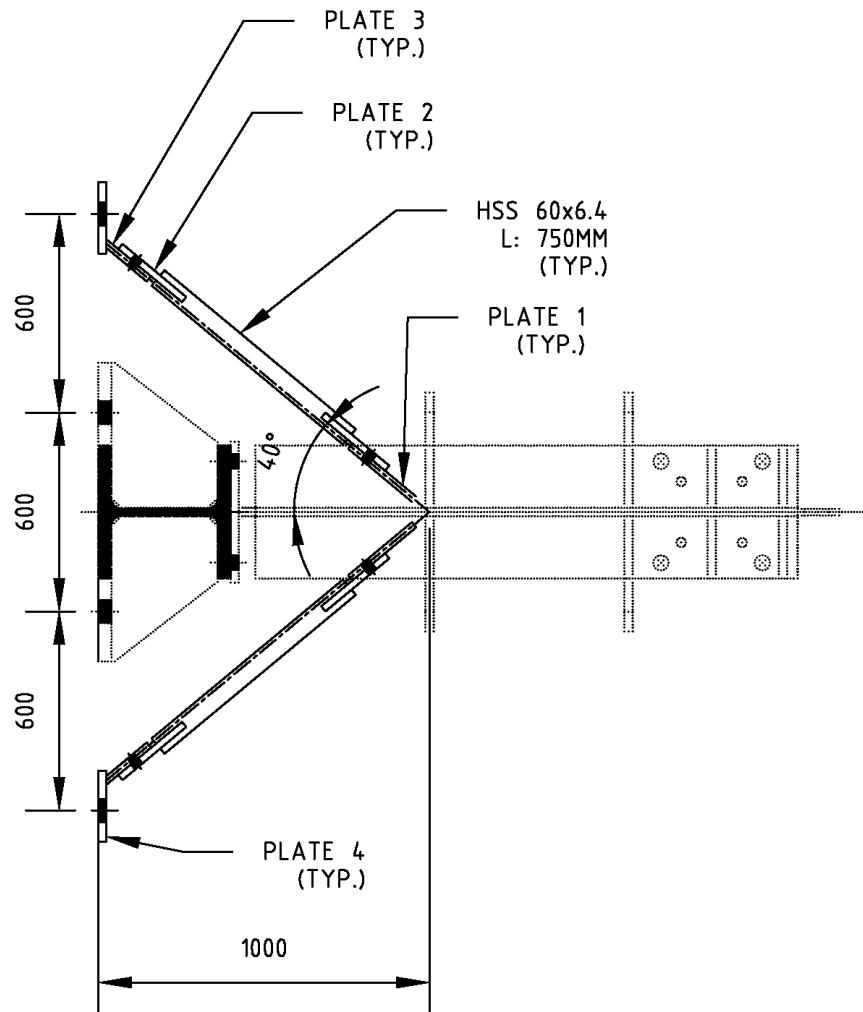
Wall mount loading system design and fabrication drawing – Drawing 24.
